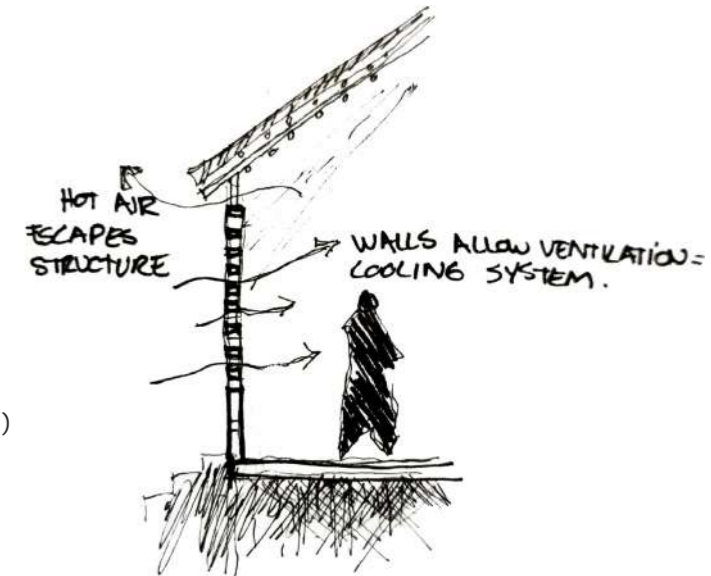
Section-Perforated clay brick wall (Author, 2021)
